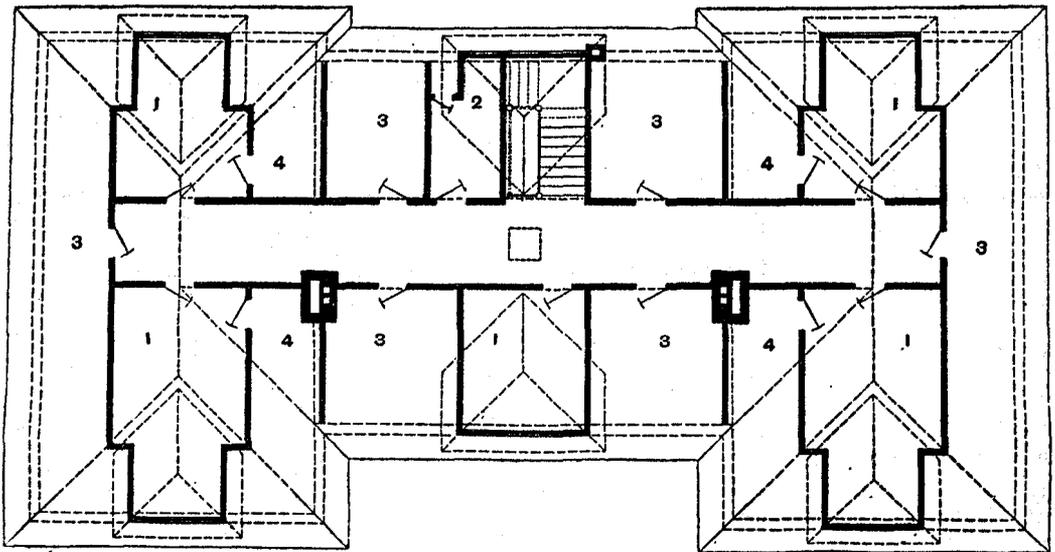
Plan of third floor of laboratory building. 1, Five bed chambers; 2, bathroom; 3, six dark storage chambers; 4, four large closets.
